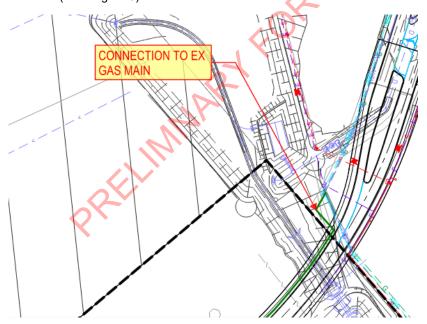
BWEZ Stage 4 Gas Connection Scheme
